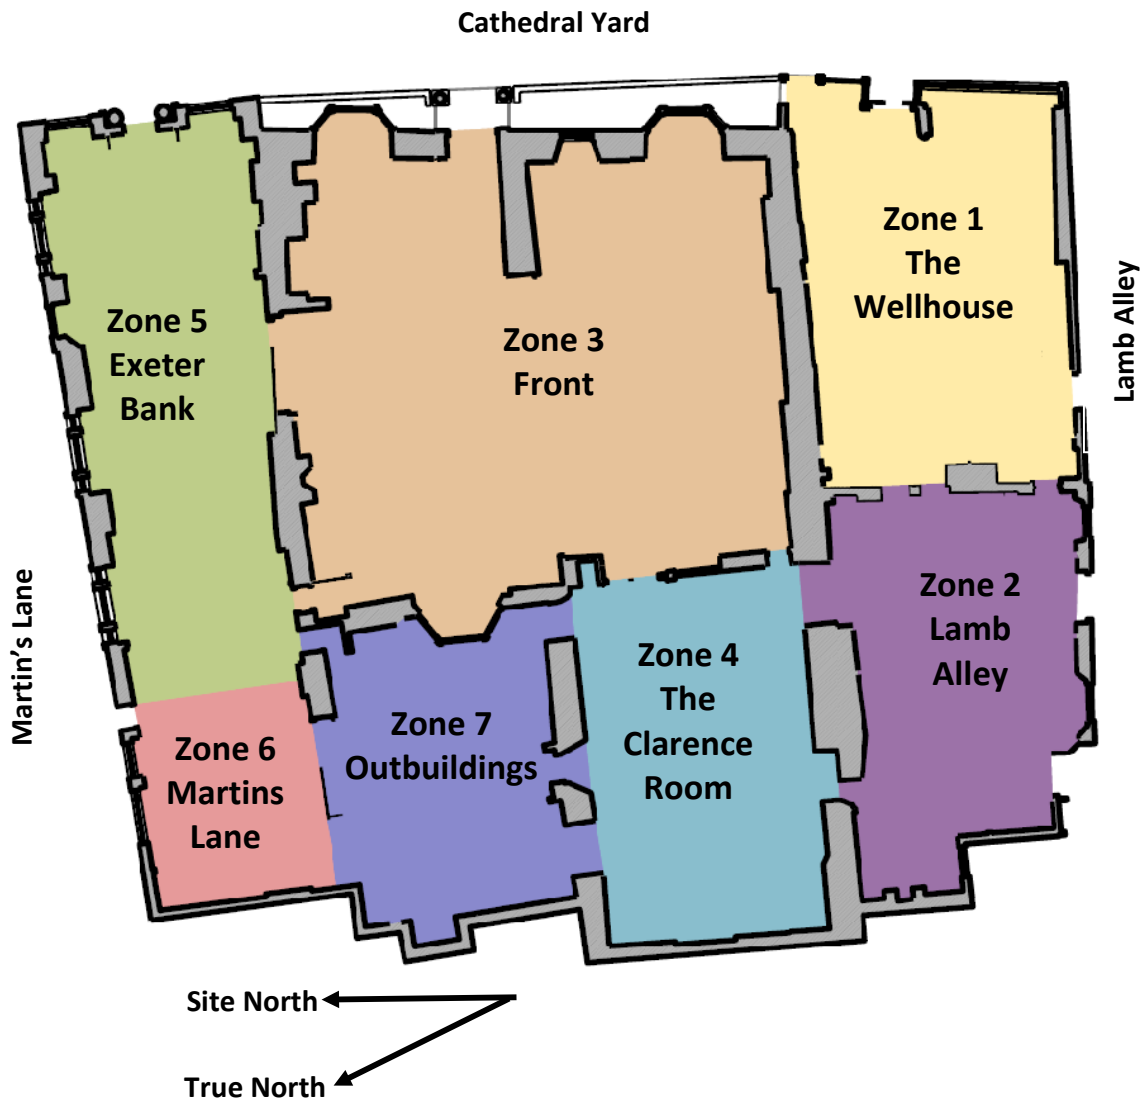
Outline plan of the Royal Clarence Hotel and the Well House Tavern (16–17 Cathedral Yard, after Buttress, Architects)
